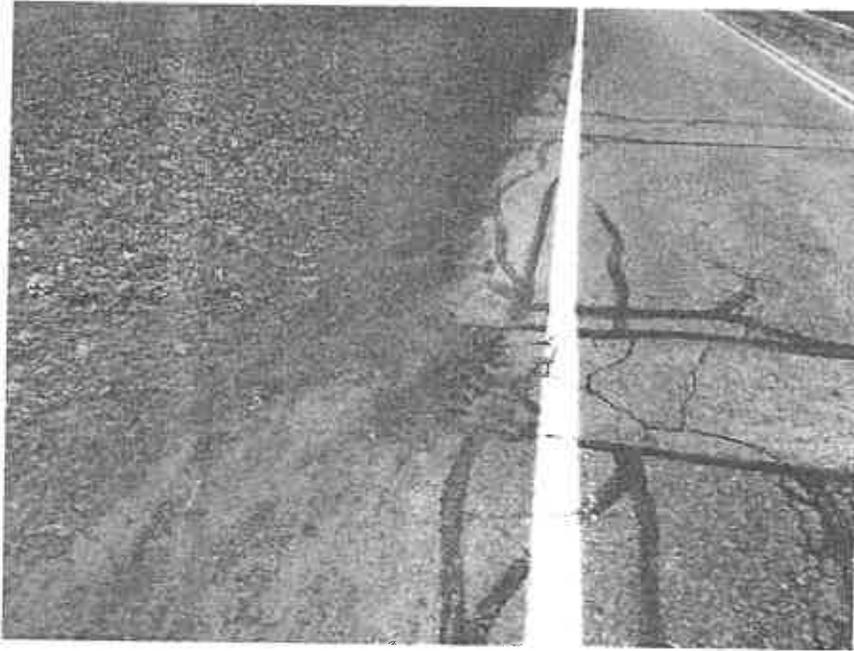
Some settlement in the water main trench in Hill Street should be repaired.
